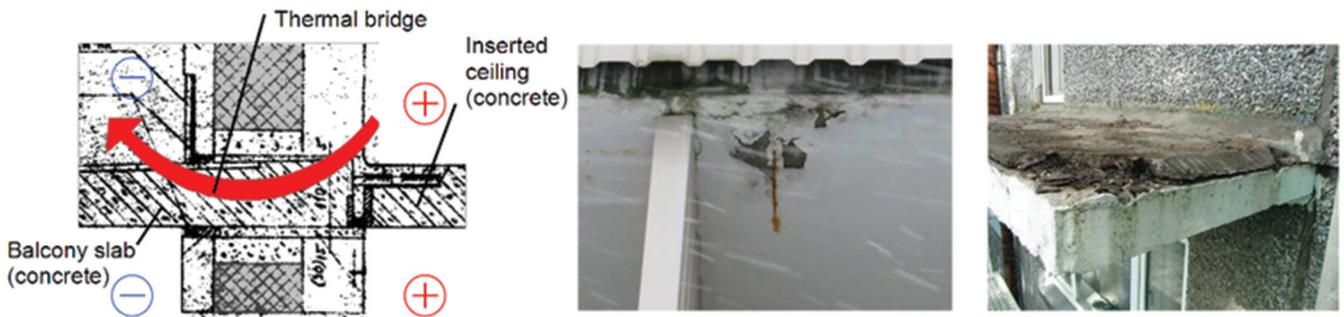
Original drawing of an external wall/console balcony junction with a thermal bridge (left) and a picture of a degrading balcony (middle and right).
